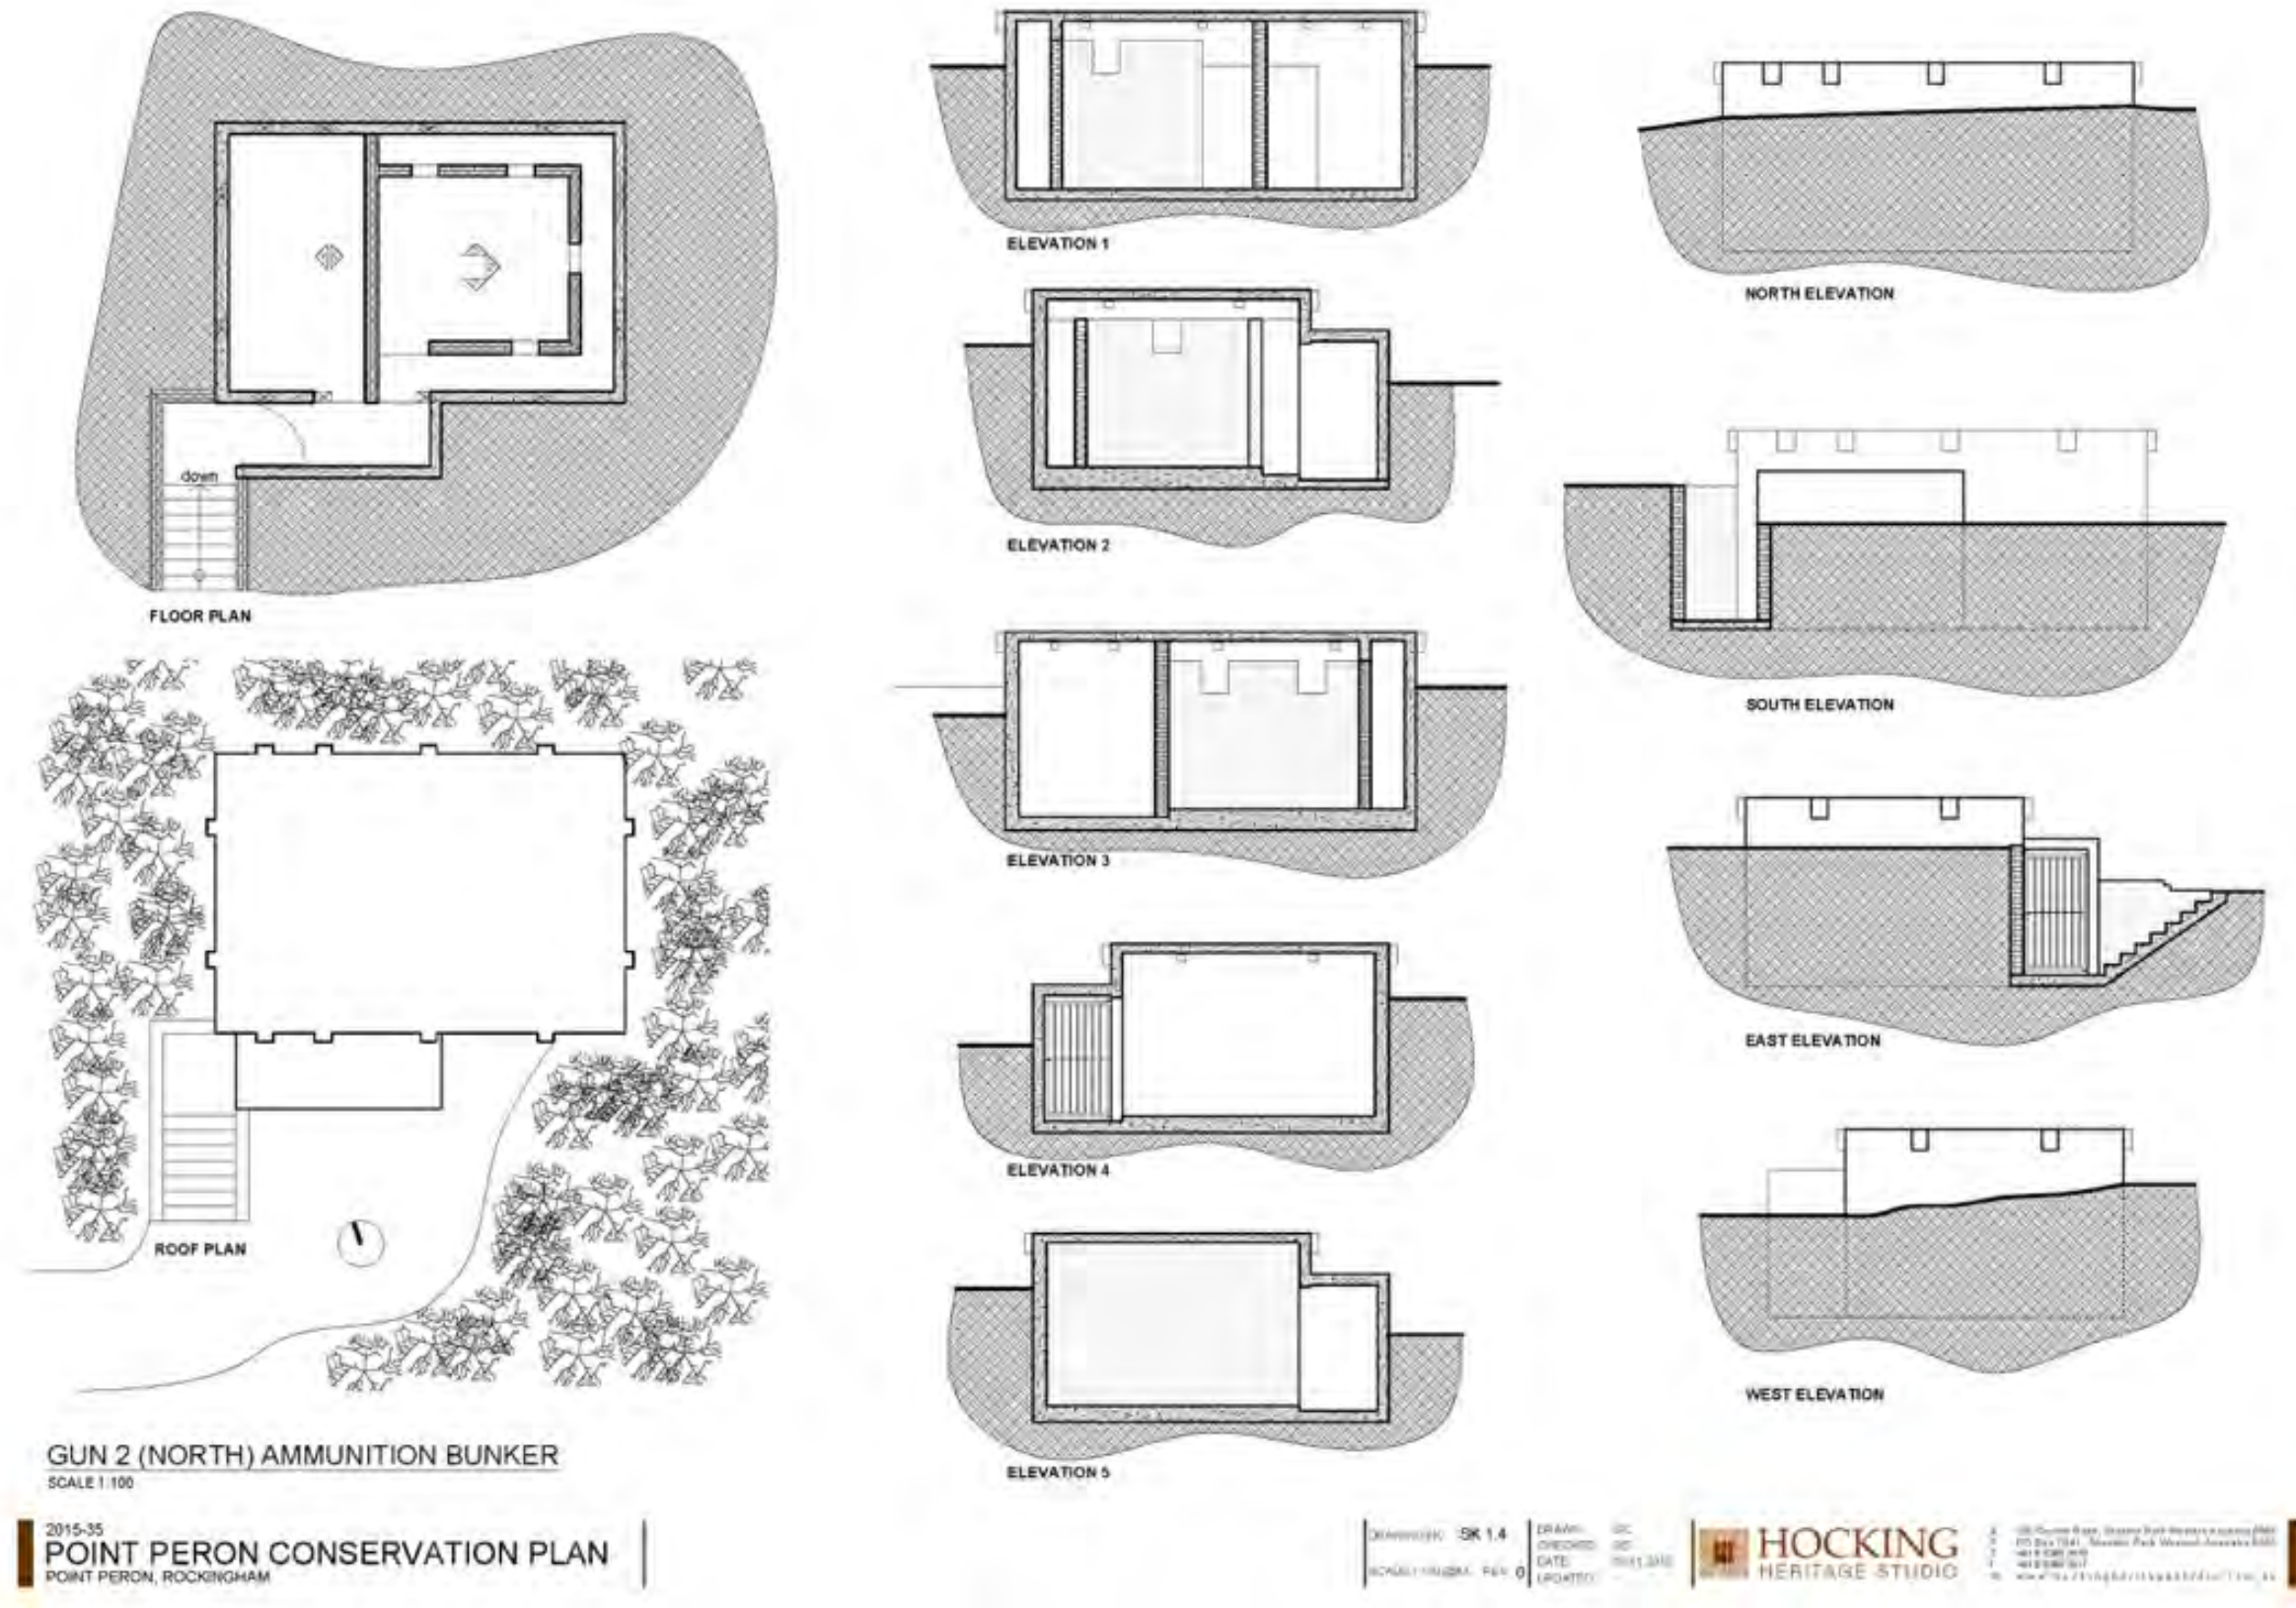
Ammunition Bunker No. 2 – Plans and Elevations
